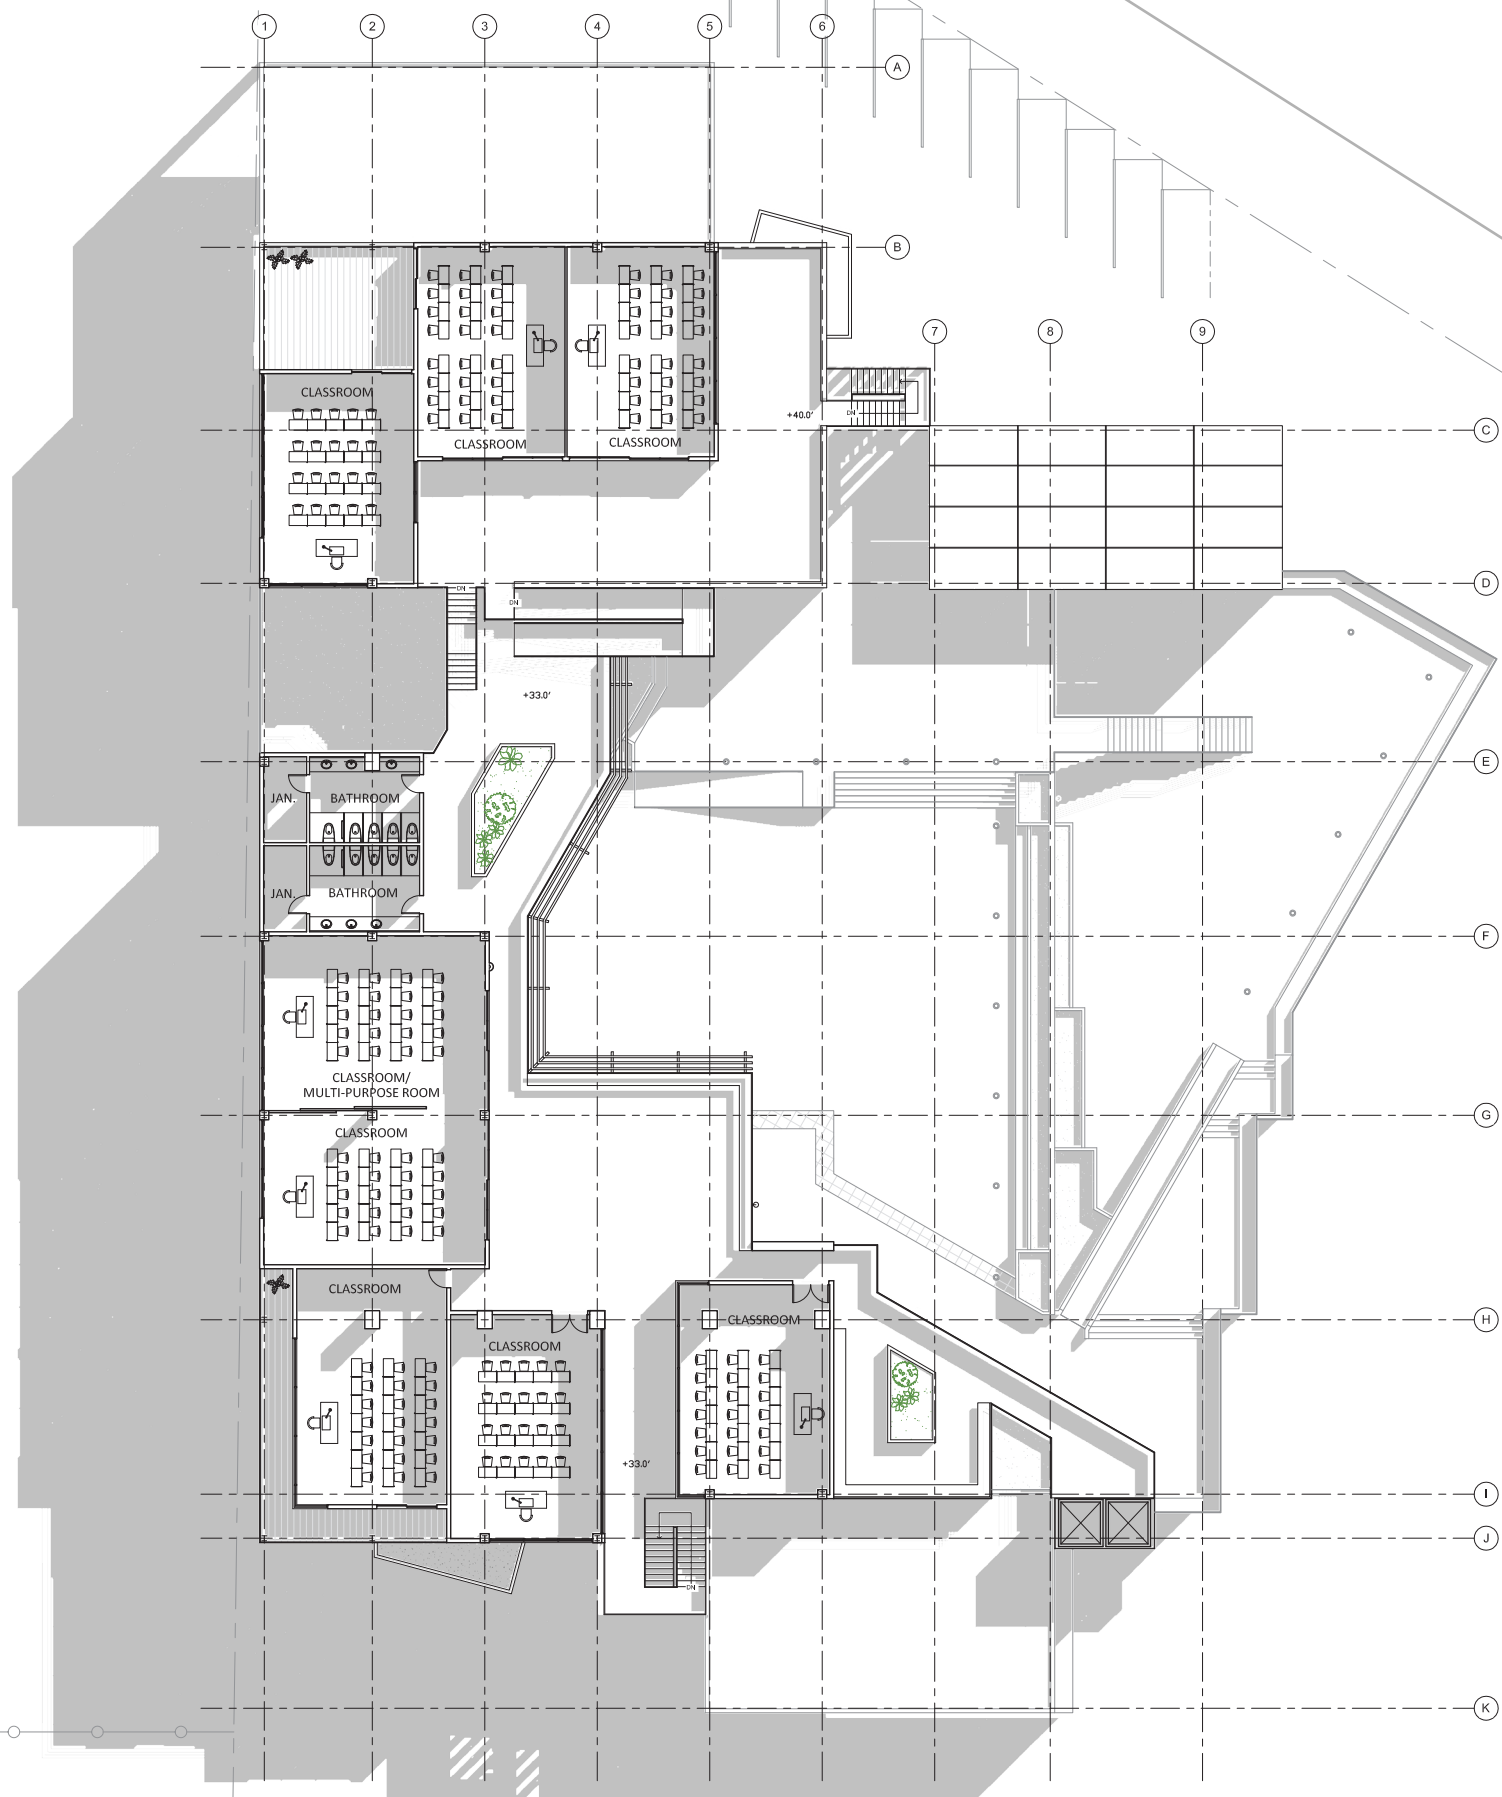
Final Design Prototype Fifth and Sixth Floor Plan
